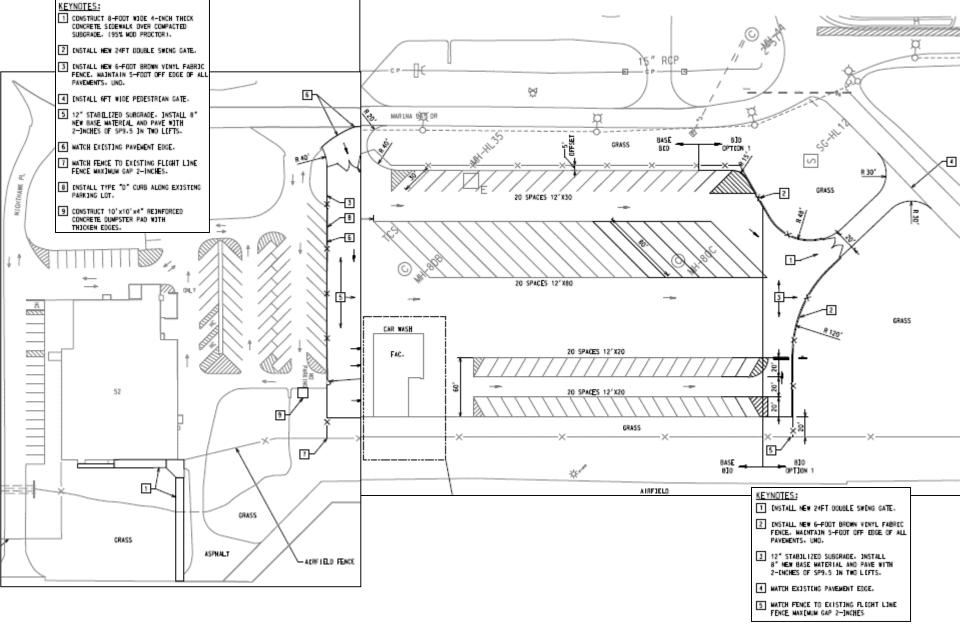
New vehicle operations area site plan (Note: Keynotes on left side correspond to the plan on the left and keynotes on the right side correspond to the plan on the right)
